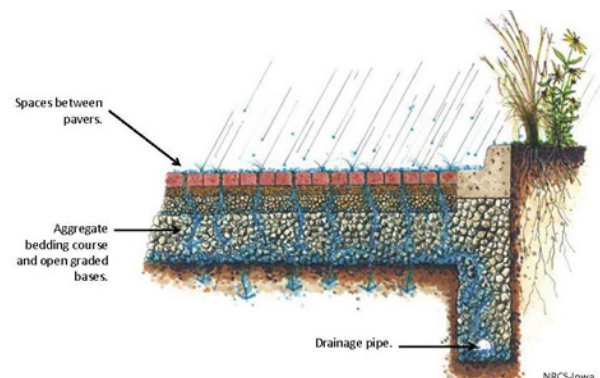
Structure of permeable pavement (<https://metroblooms.org/2016/12/22/permeable-pavement-maintenance/>)
